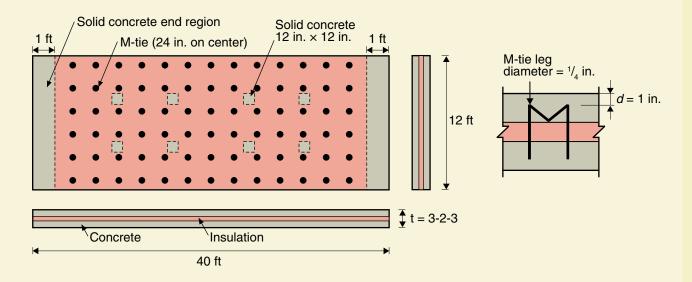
This figure shows a 3-2-3 precast concrete sandwich panel. Its concrete wythes are connected by M-ties and areas of solid concrete. Note: Drawing is not to scale. 3-2-3 is in inches. 1 in. = 25.4 mm; 1 ft = 0.3048 m.
